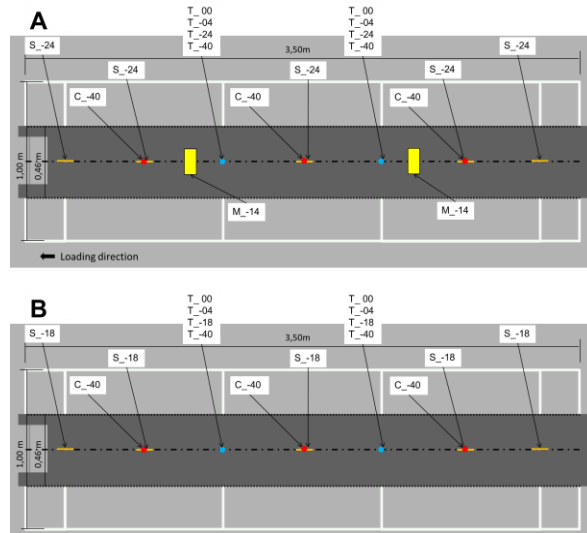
Sketch of the test lane, its pavement sections and different loading areas
